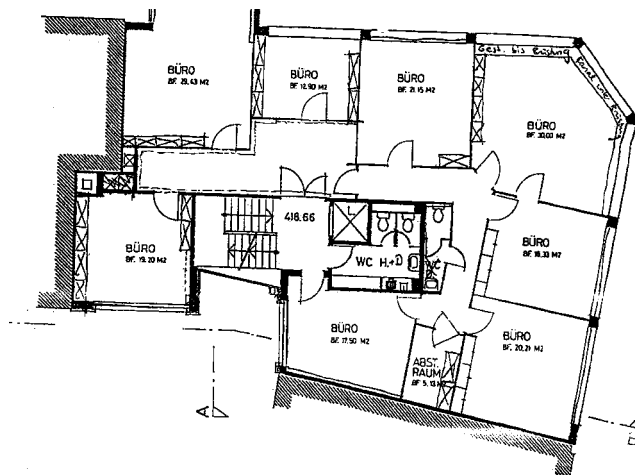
Plan view of the 3rd floor; the 4th floor looks similar. The intermediate walls are probably from gypsum or masonry.
